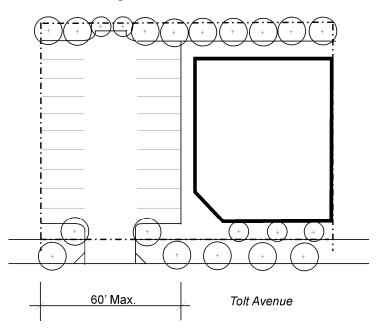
Any parking lots located adjacent to Tolt Avenue between Rutherford and Eugene Streets must be limited to 60' of street frontage.
